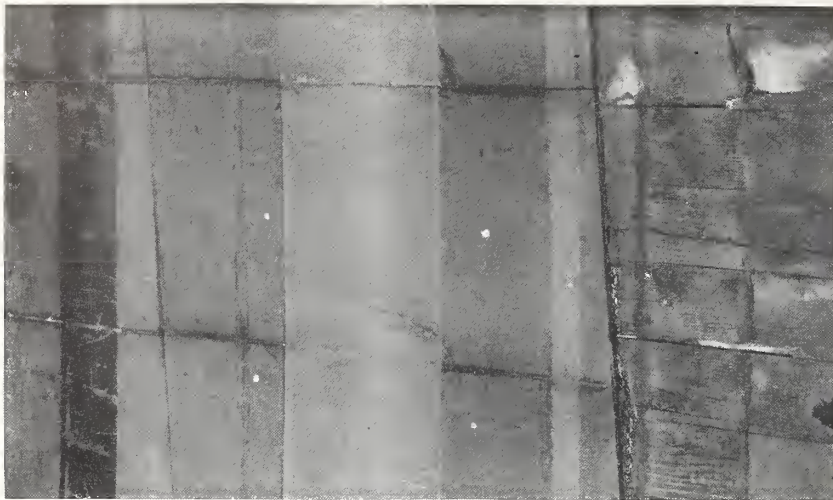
$\frac{3}{16}$ -in. asphalt tile, asphalt type, on wood subfloor (test panel 16R).
